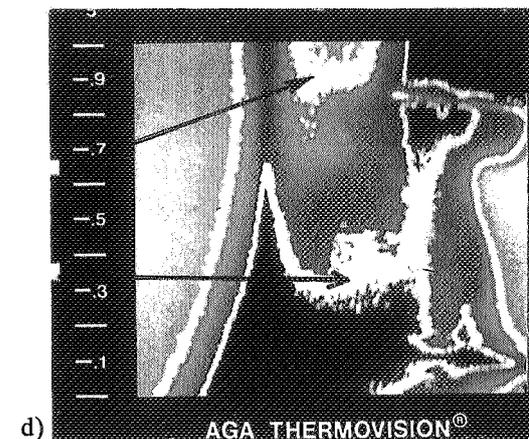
Insulation and airtightness defect in external wall due to lack of contact between outer mineral wool insulation, wall studs and sole plate.
